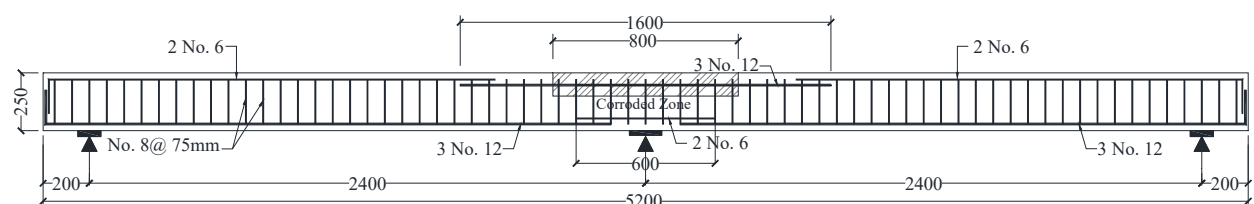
Geometry and details regarding reinforcement of beam models with hogging corrosion (dimensions are in mm).
